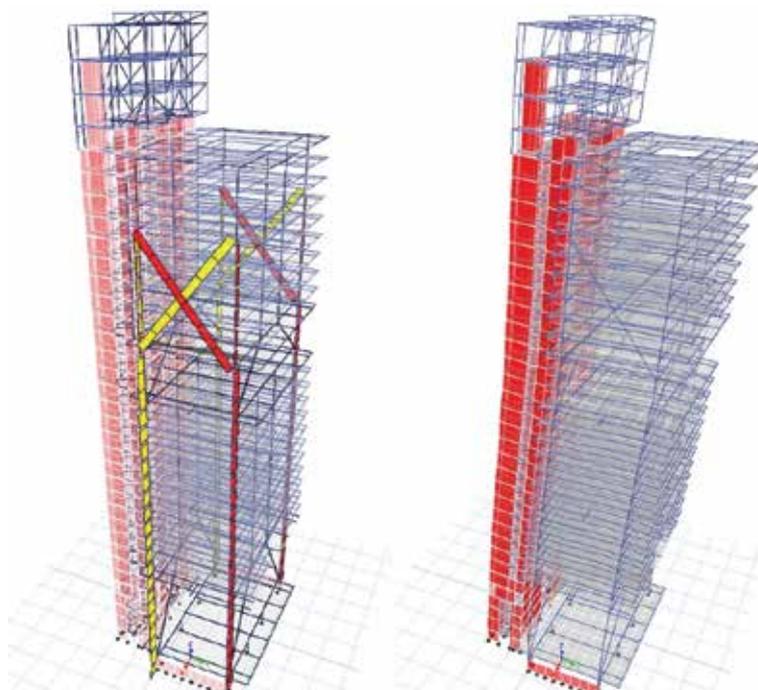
Structural analysis under fire load case with Zone 2 fire condition (Source: Arup)
